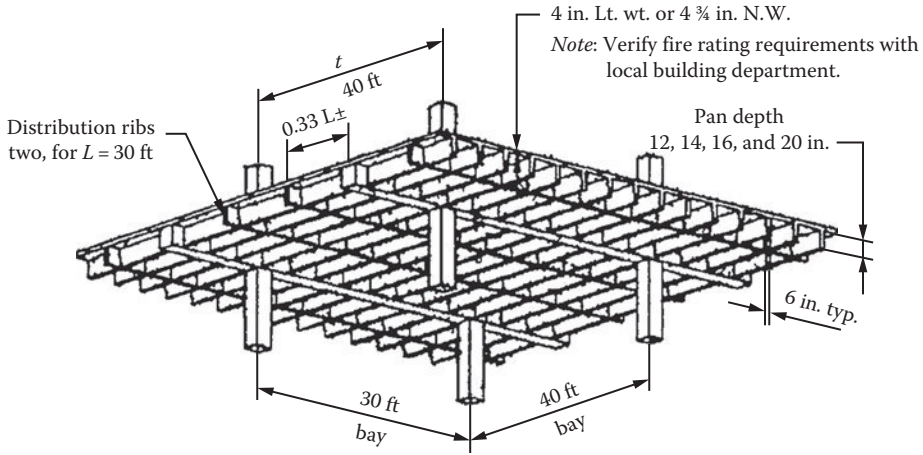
Beam and slab system 30 ft x 40 ft bays.
